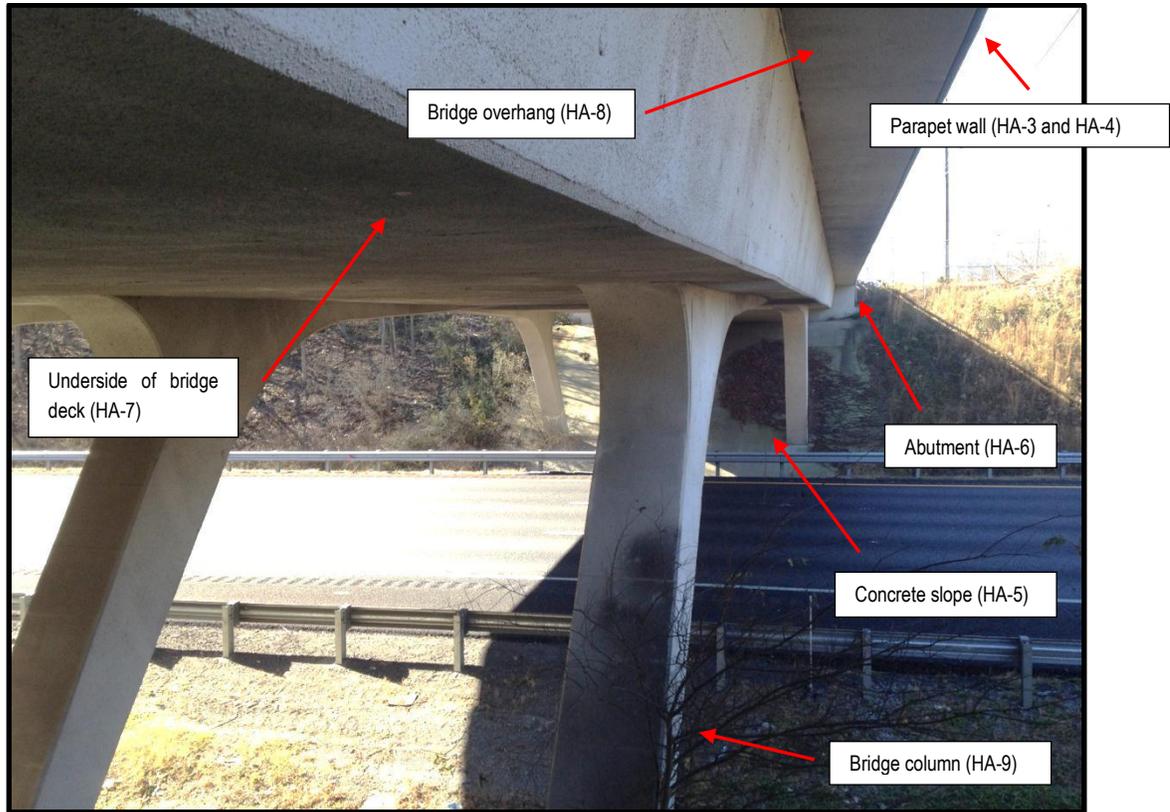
View of the asbestos-containing materials: parapet wall (HA-3), concrete slope (HA-5), abutment (HA-6), underside deck (HA-7), bridge overhang (HA-8), and bridge column (HA-9).
